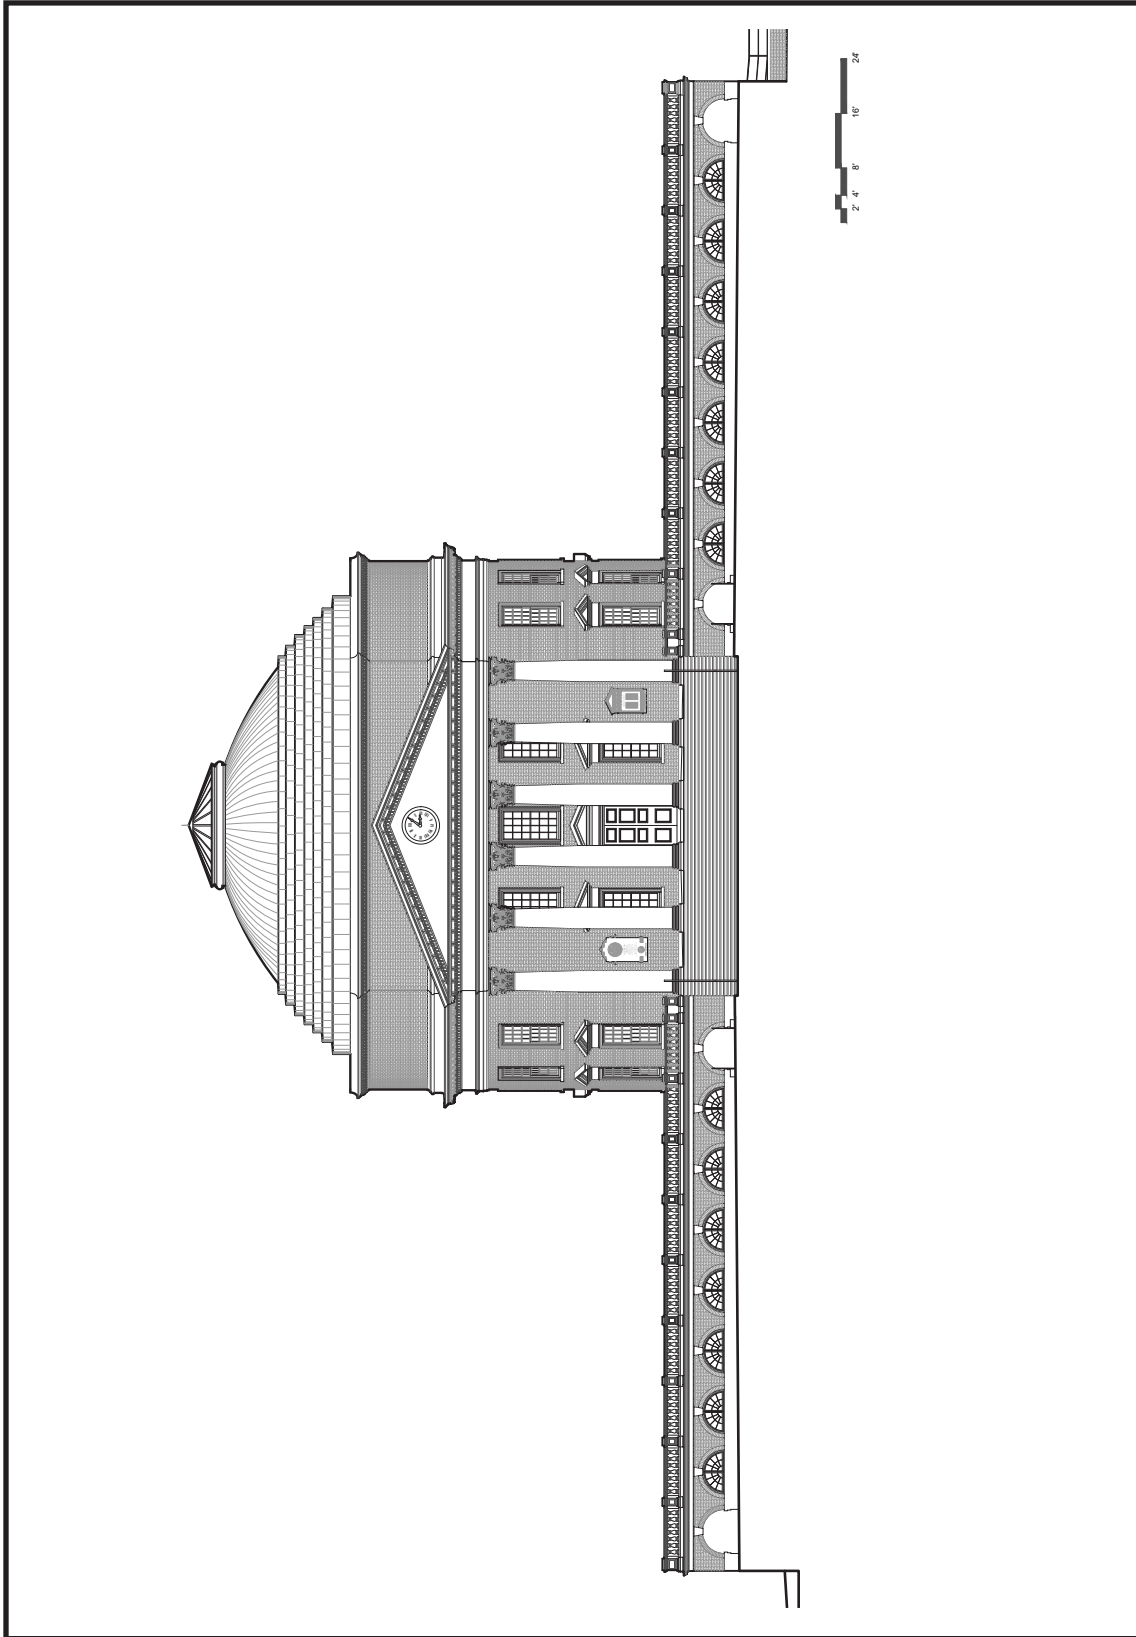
South elevation. Drawing by John G. Waite Associates, Architects, 2022.
